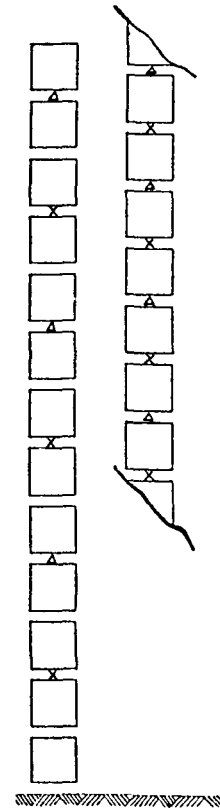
(a) In-Rack Sprinkler Arrangement, Group A Plastic Commodity, Single Row Racks, Height of Storage over 25 Ft.
